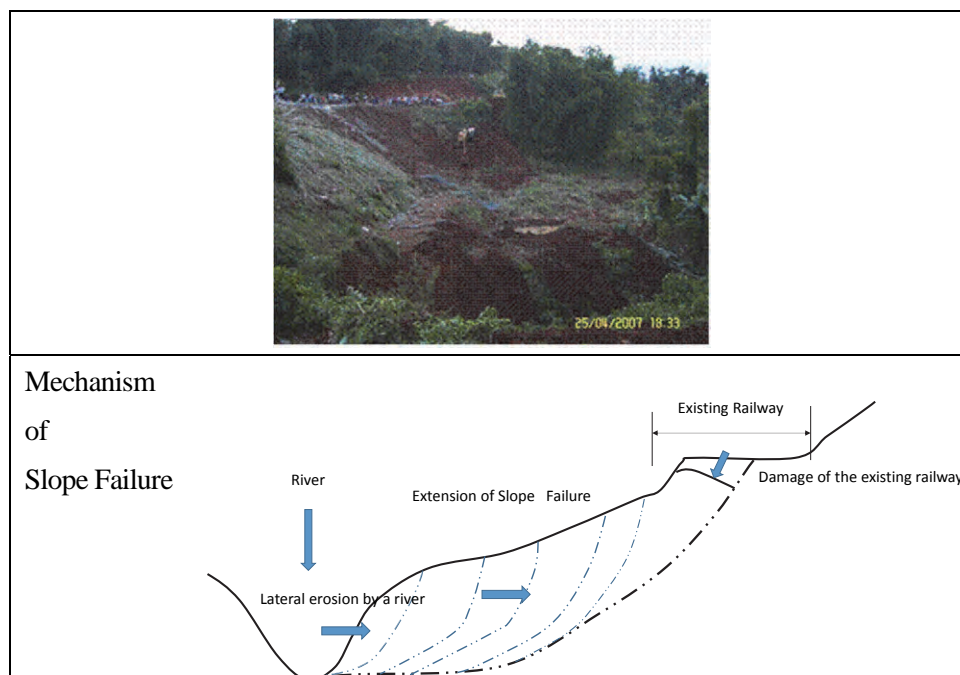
Example of Existing Slope Failure Caused by Erosion of River
